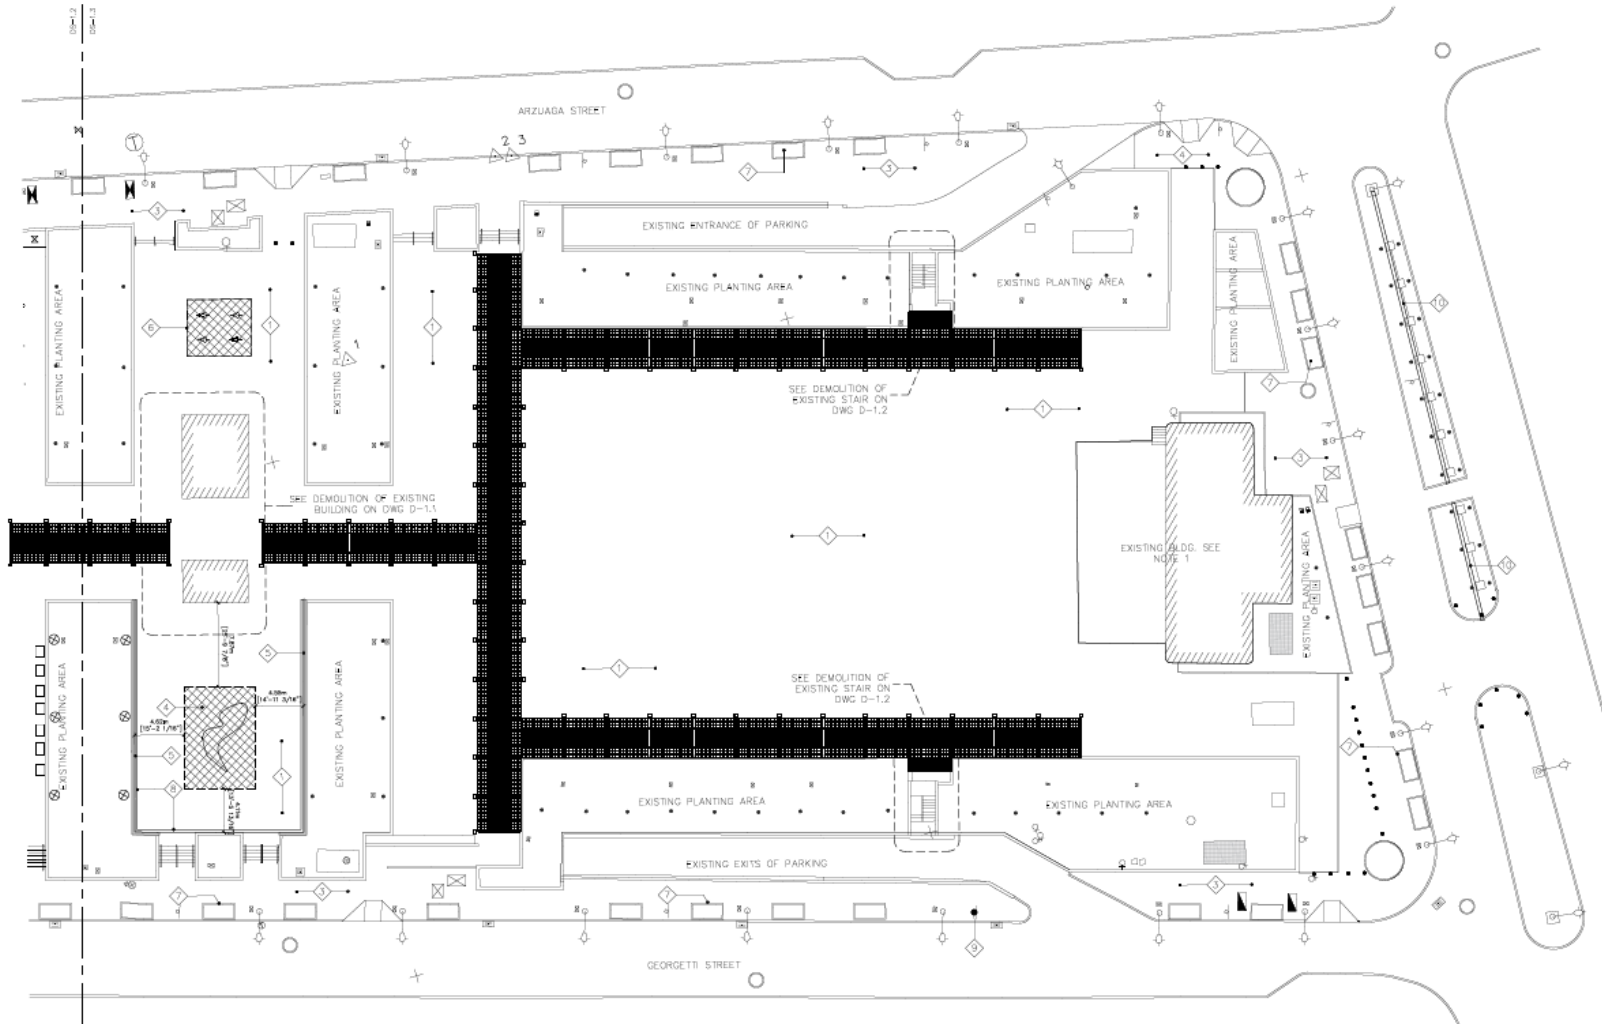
Plaza del Pilar and Plaza de la convalecencia. Proposed plazas site plan. (Source:Source: Drawing AS-1.0, Hernández-Bauzá PSC Architects, 2024)
